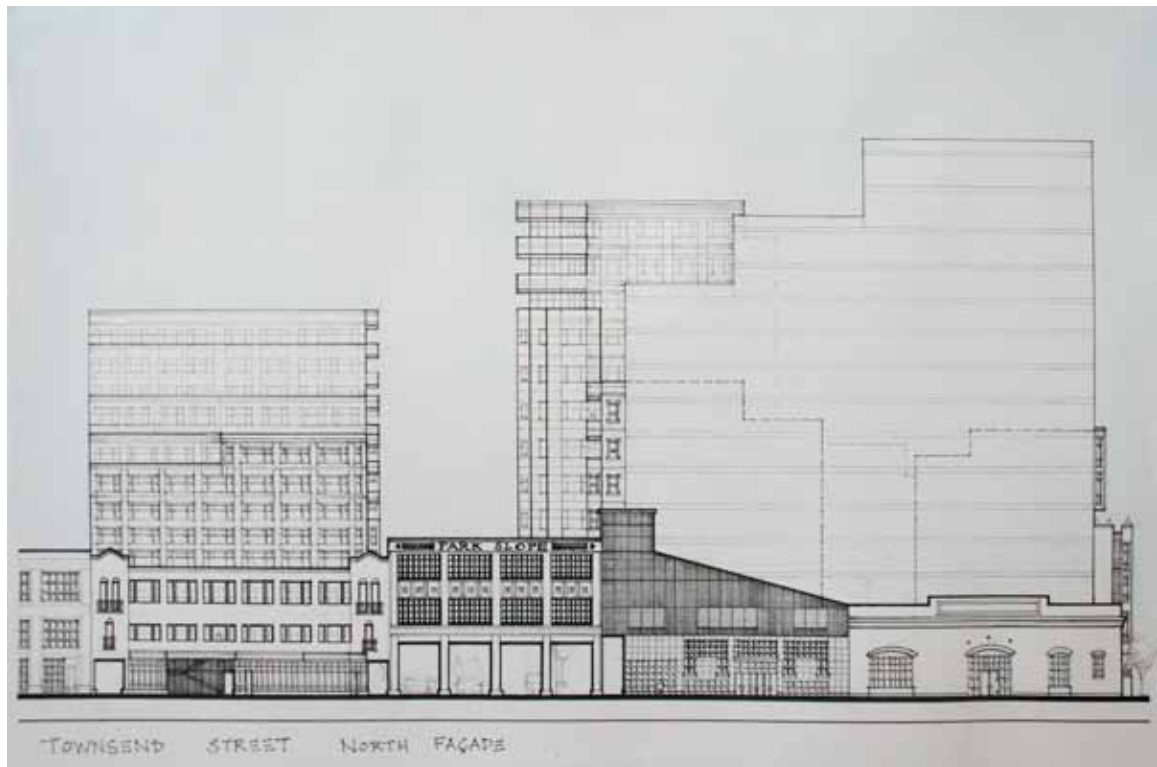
Townsend Street, North Facade showing Historic Urban Fabric
